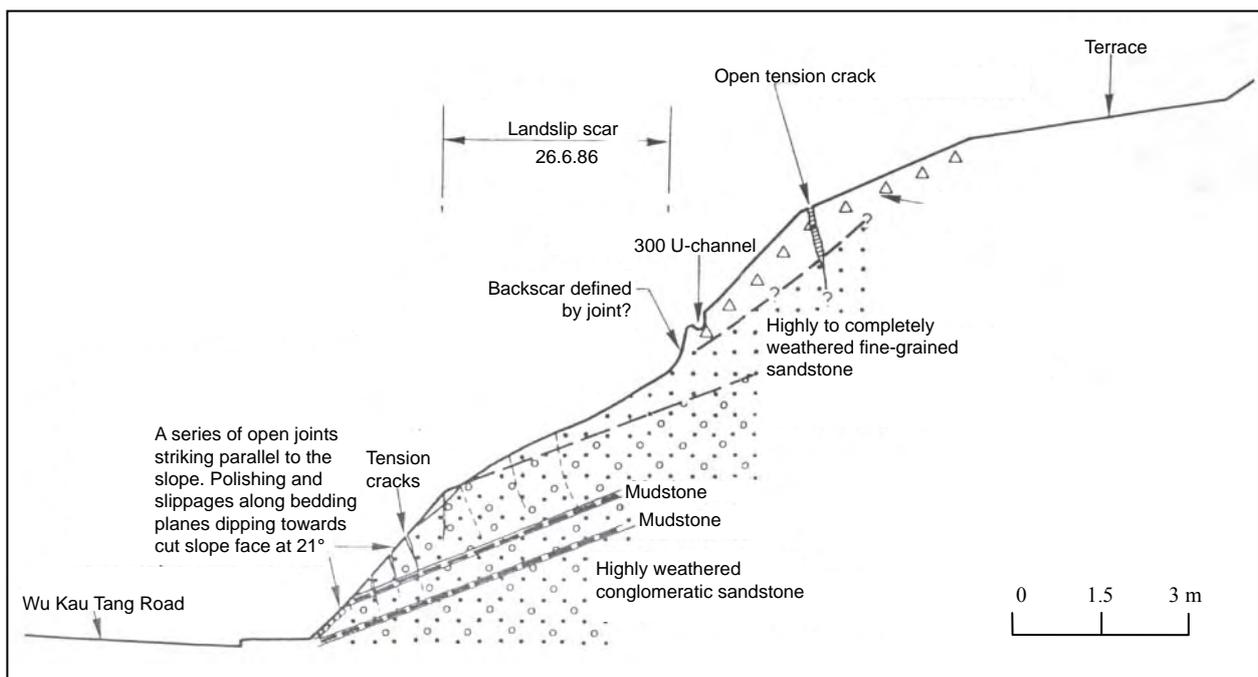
Section through the 1986-87 landslide at Wu Kau Tang Road (Irfan & Cipullo, 1988)
